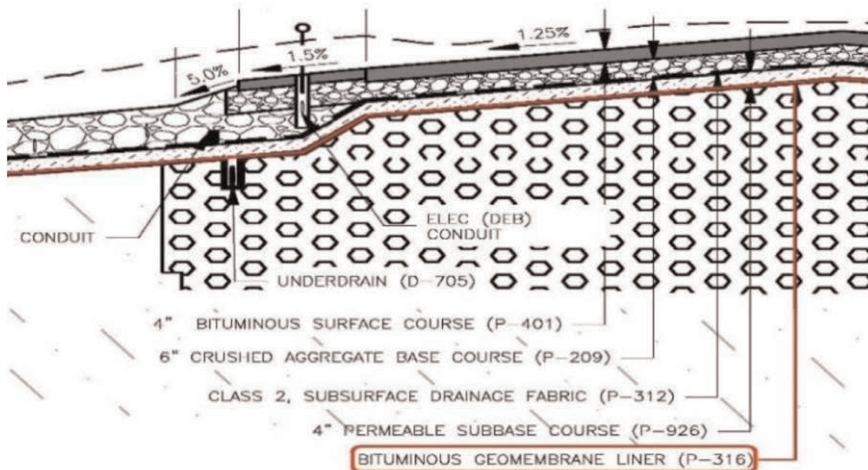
Cross-section adopted for the reconstruction under the layer of asphalt concrete.
